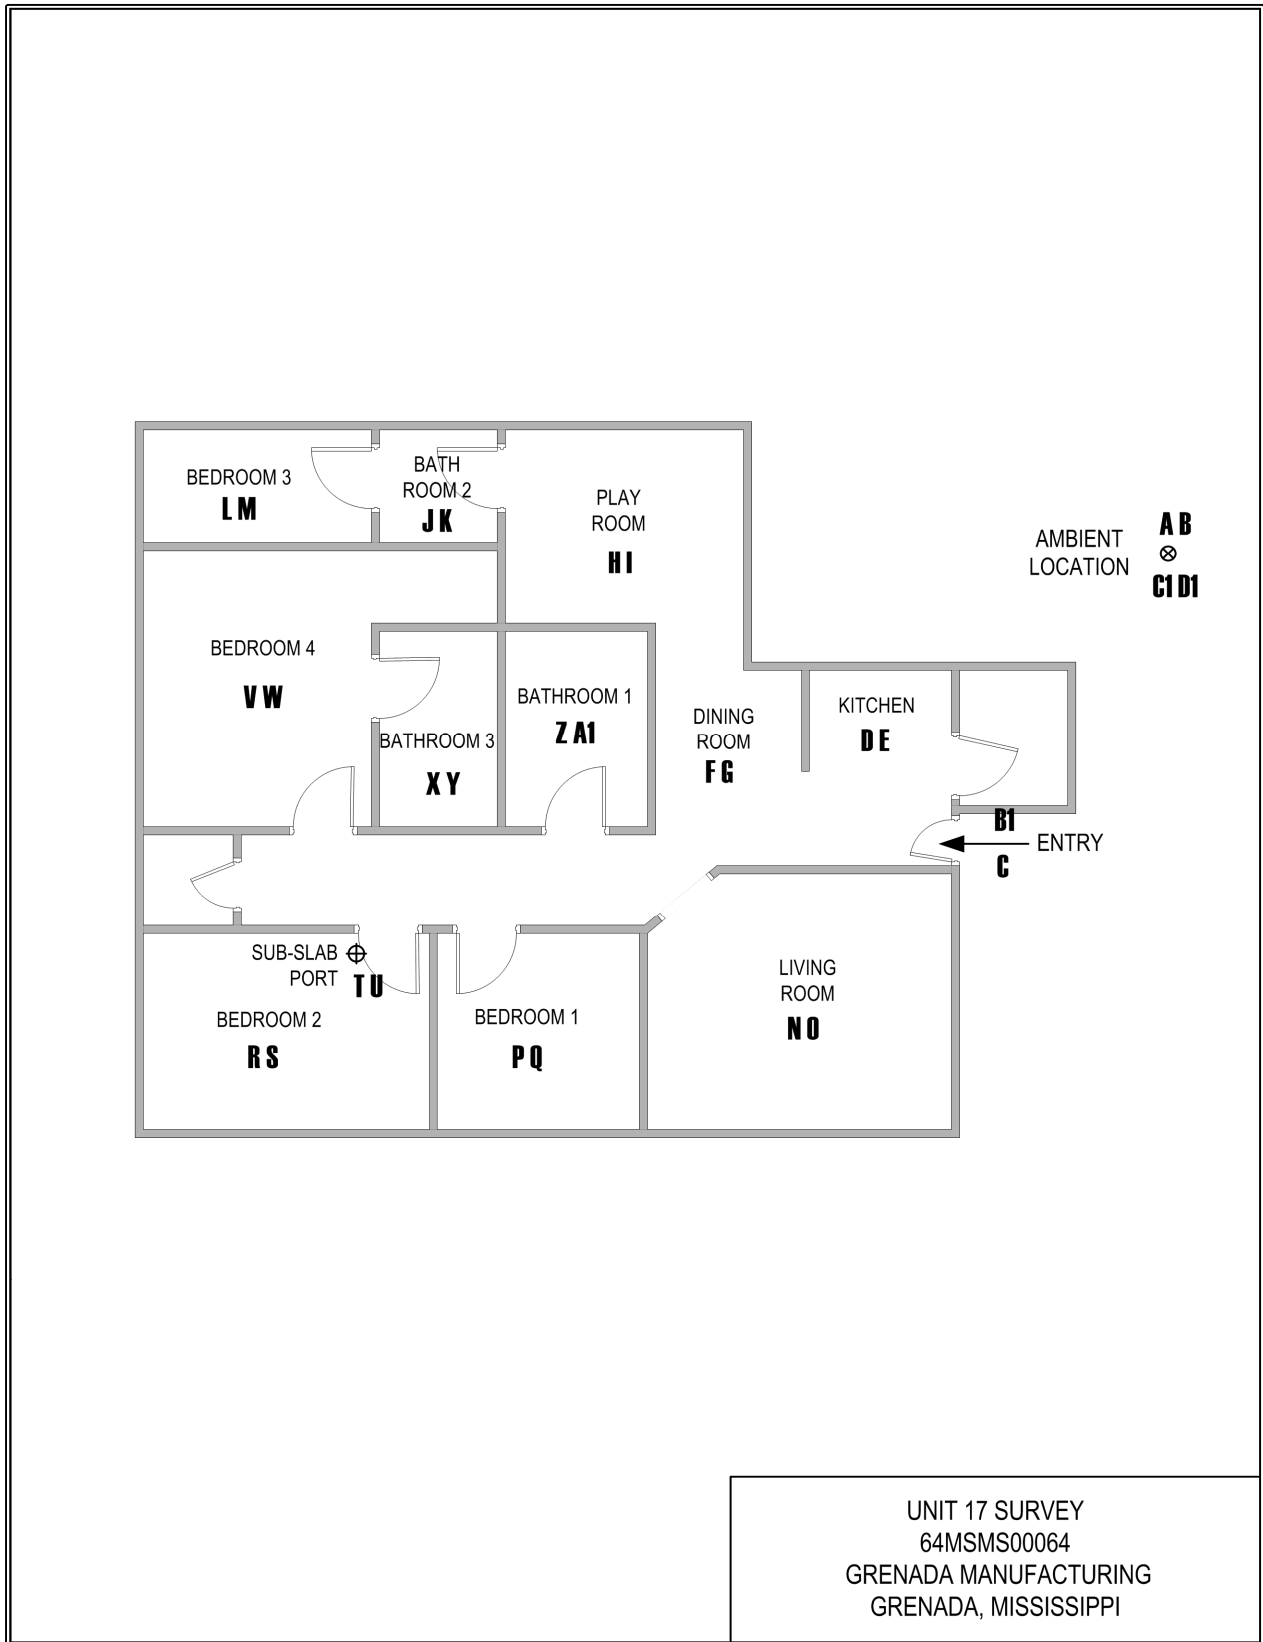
Unit 17 Survey Floor Plan, 64MSMS00064
